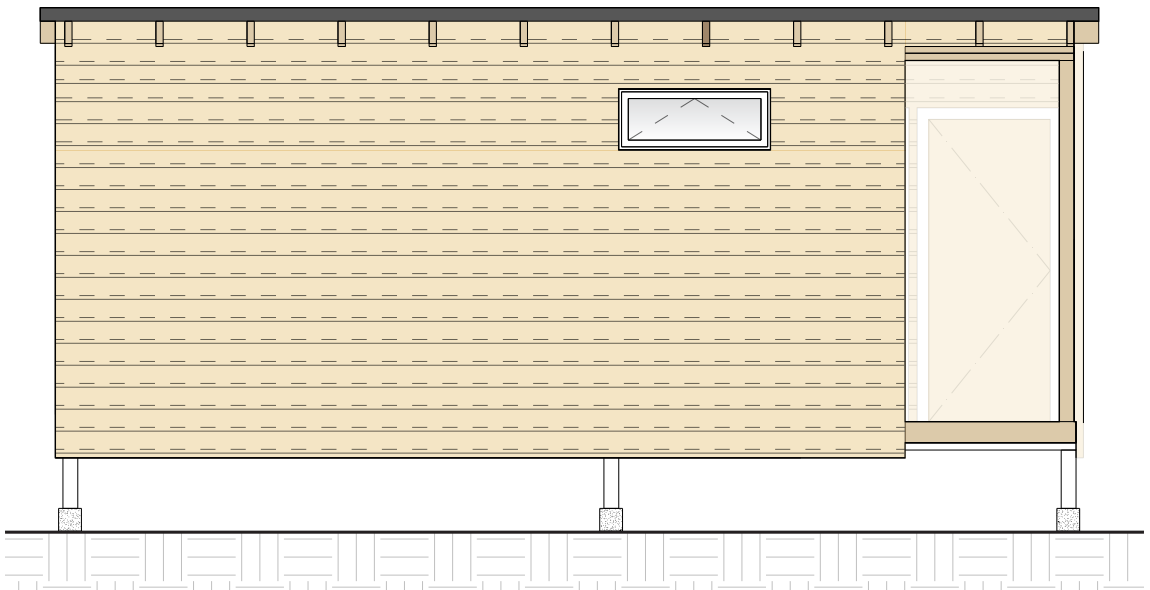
ELEVATION B-B OF THE BUILT CABIN. SCALE 1:50
